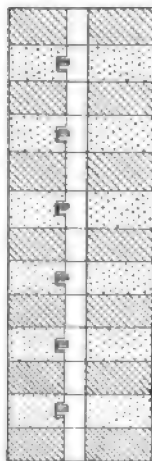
Caving System. Plan showing filled rooms, pillars, raises, level, etc.
